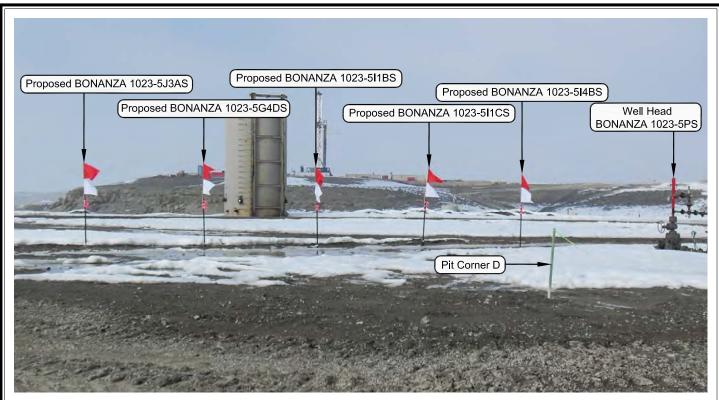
PHOTO VIEW: FROM PIT CORNER D TO LOCATION STAKES
